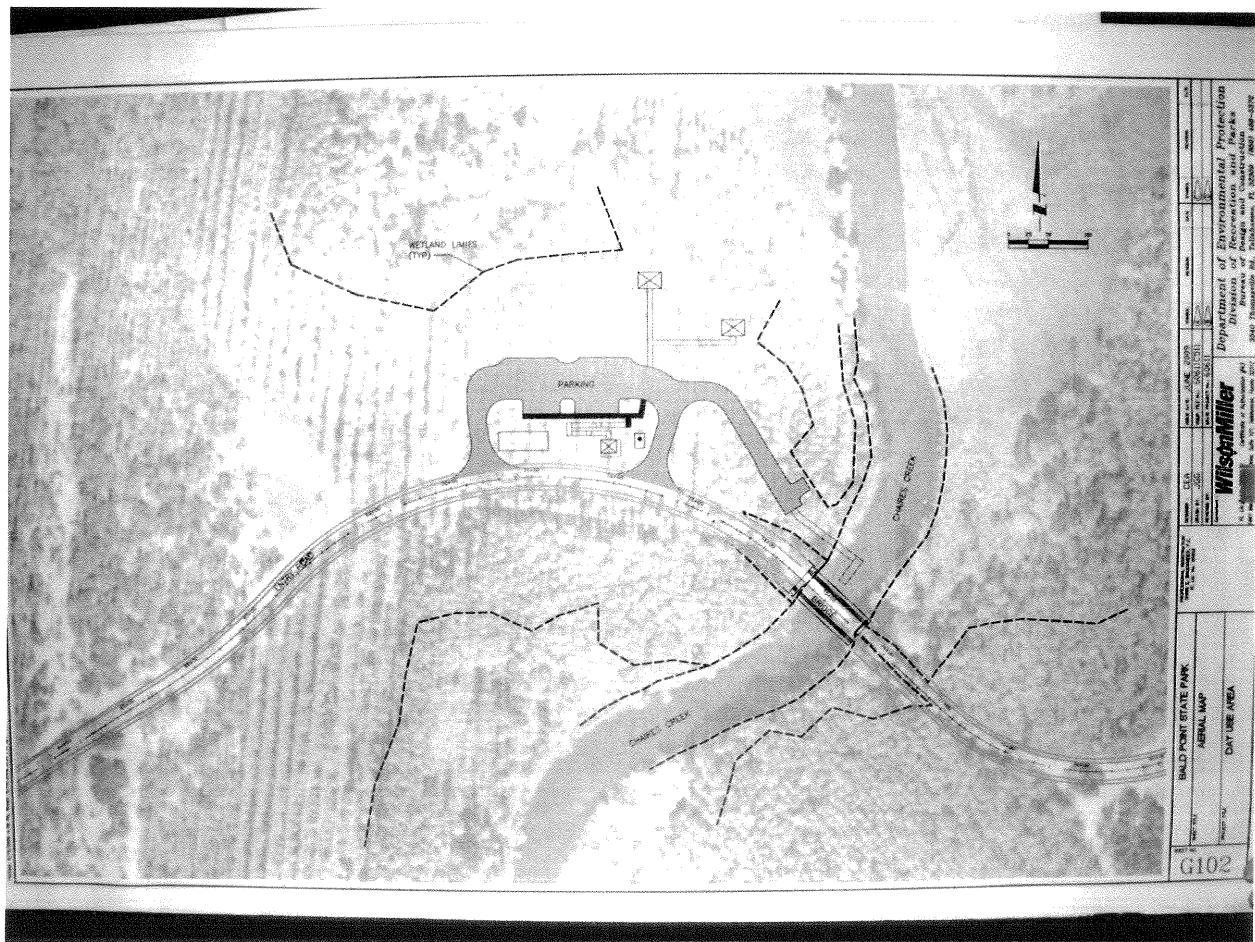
Additional detail for proposed facilities to be developed at Bald Point State Park Recreation Areas near Chaires Creek.
